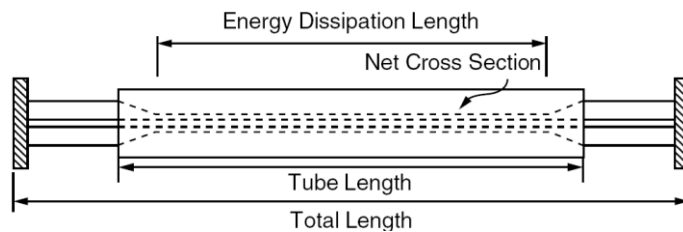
Geometry of buckling – restrained brace test specimens [16]
